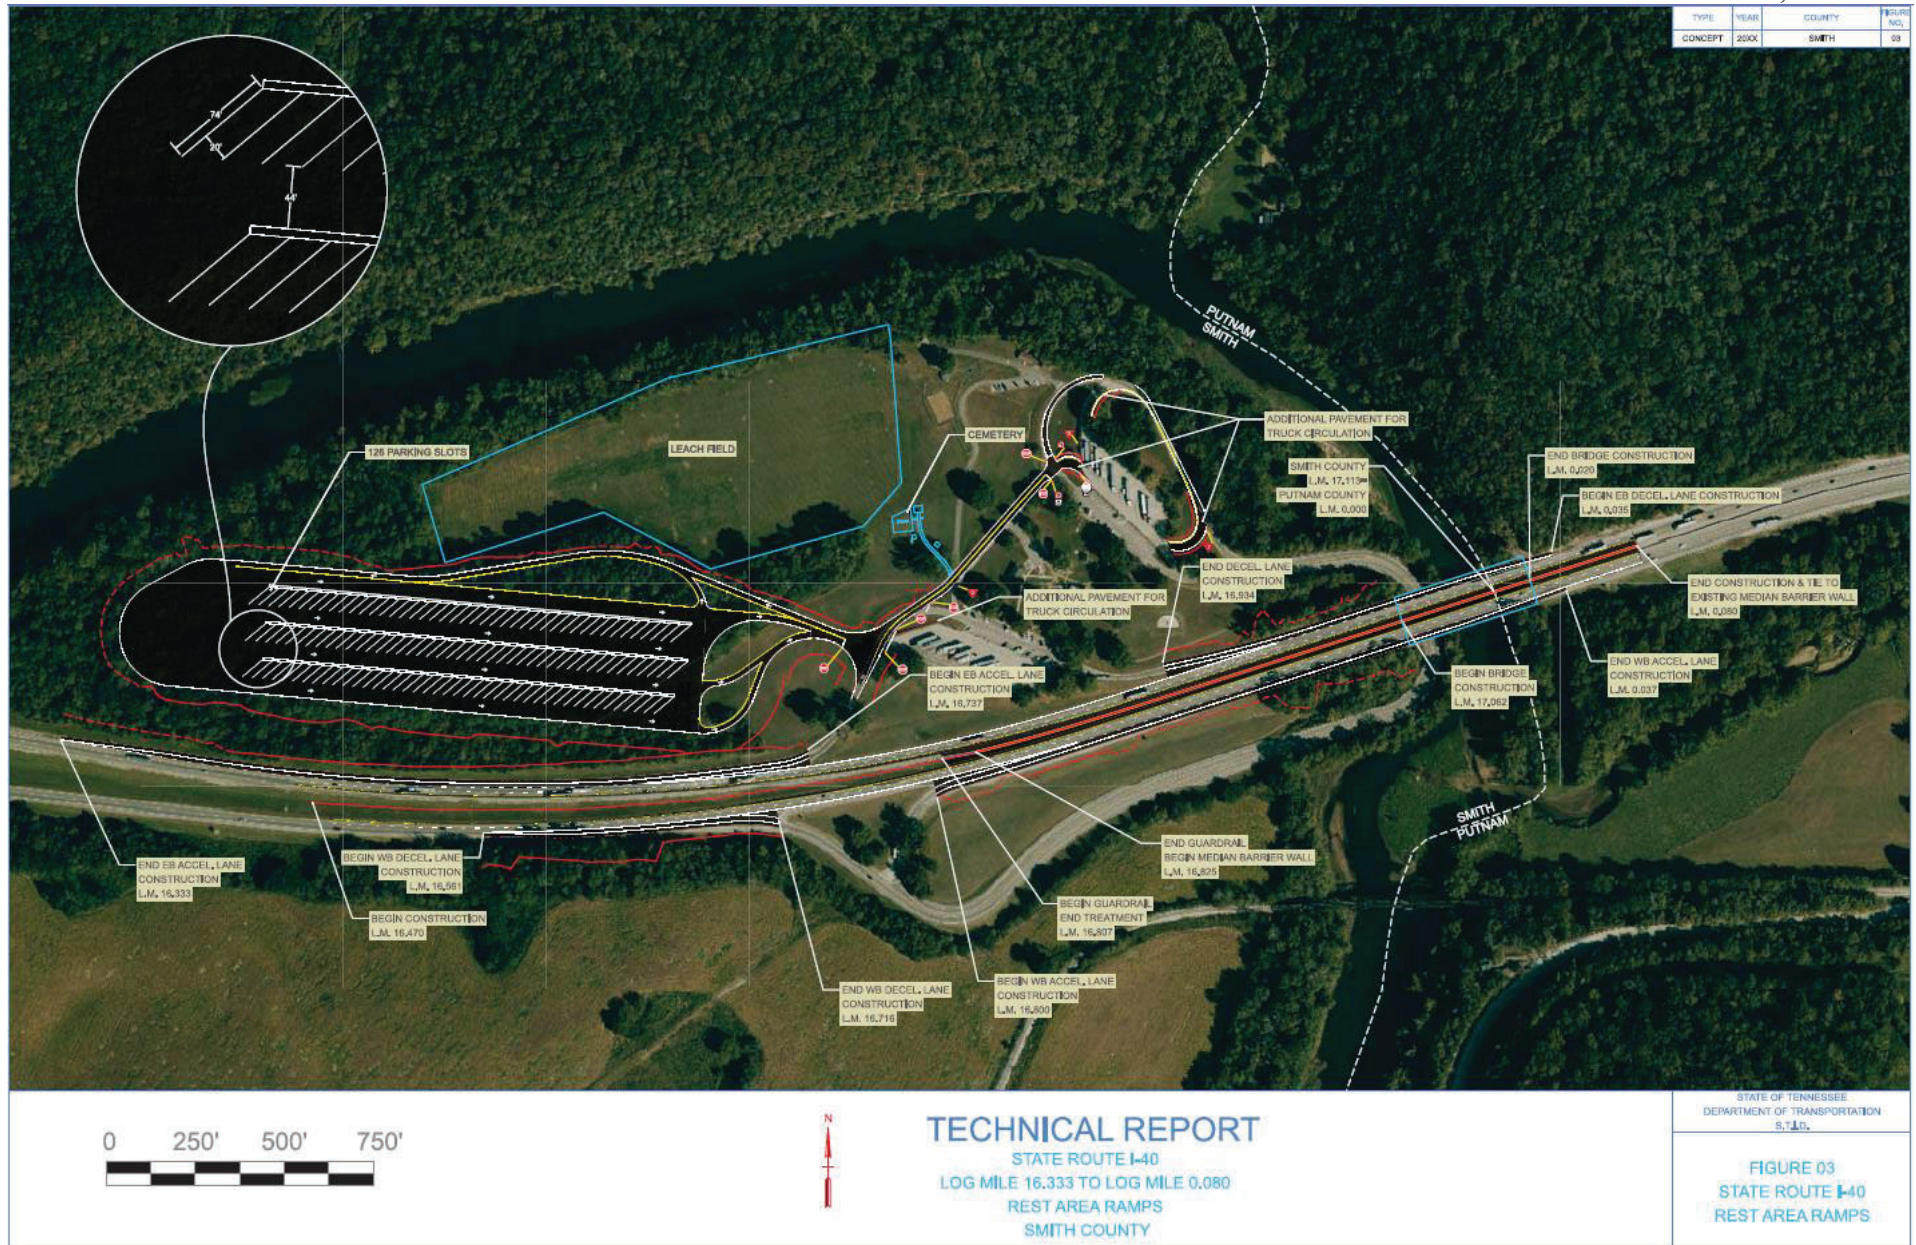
Conceptual design for truck parking, rest area ramps, and bridge replacement.
